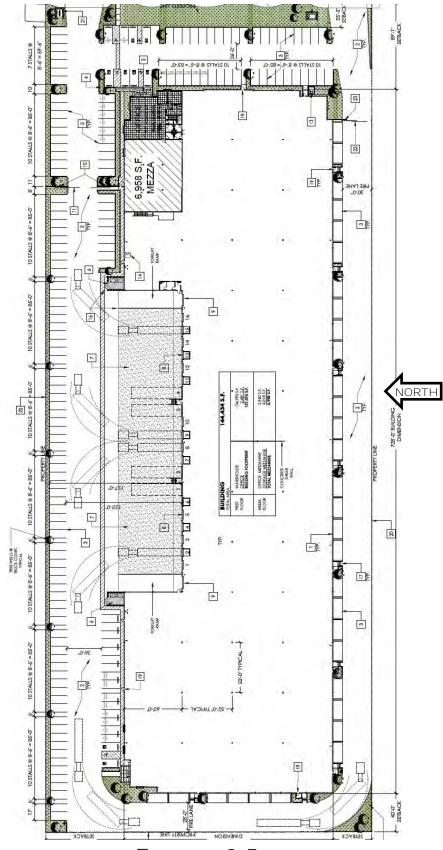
CONCEPTUAL SITE PLAN
